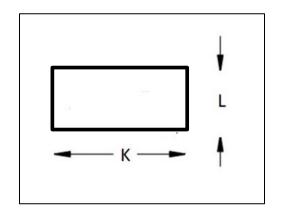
HANDRAIL/HANDRAIL PROFILE DIMENSIONS
